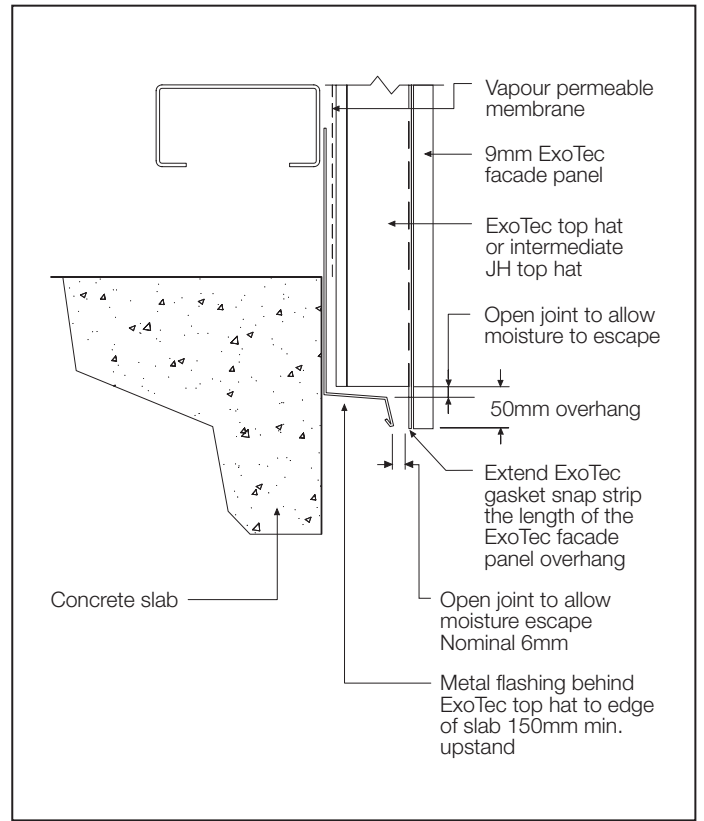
WALL BASE TYPICAL DETAIL 1
